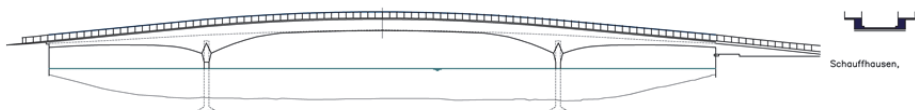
Robert Maillart's cantilever Schaffhausen bridge, 1:1250
